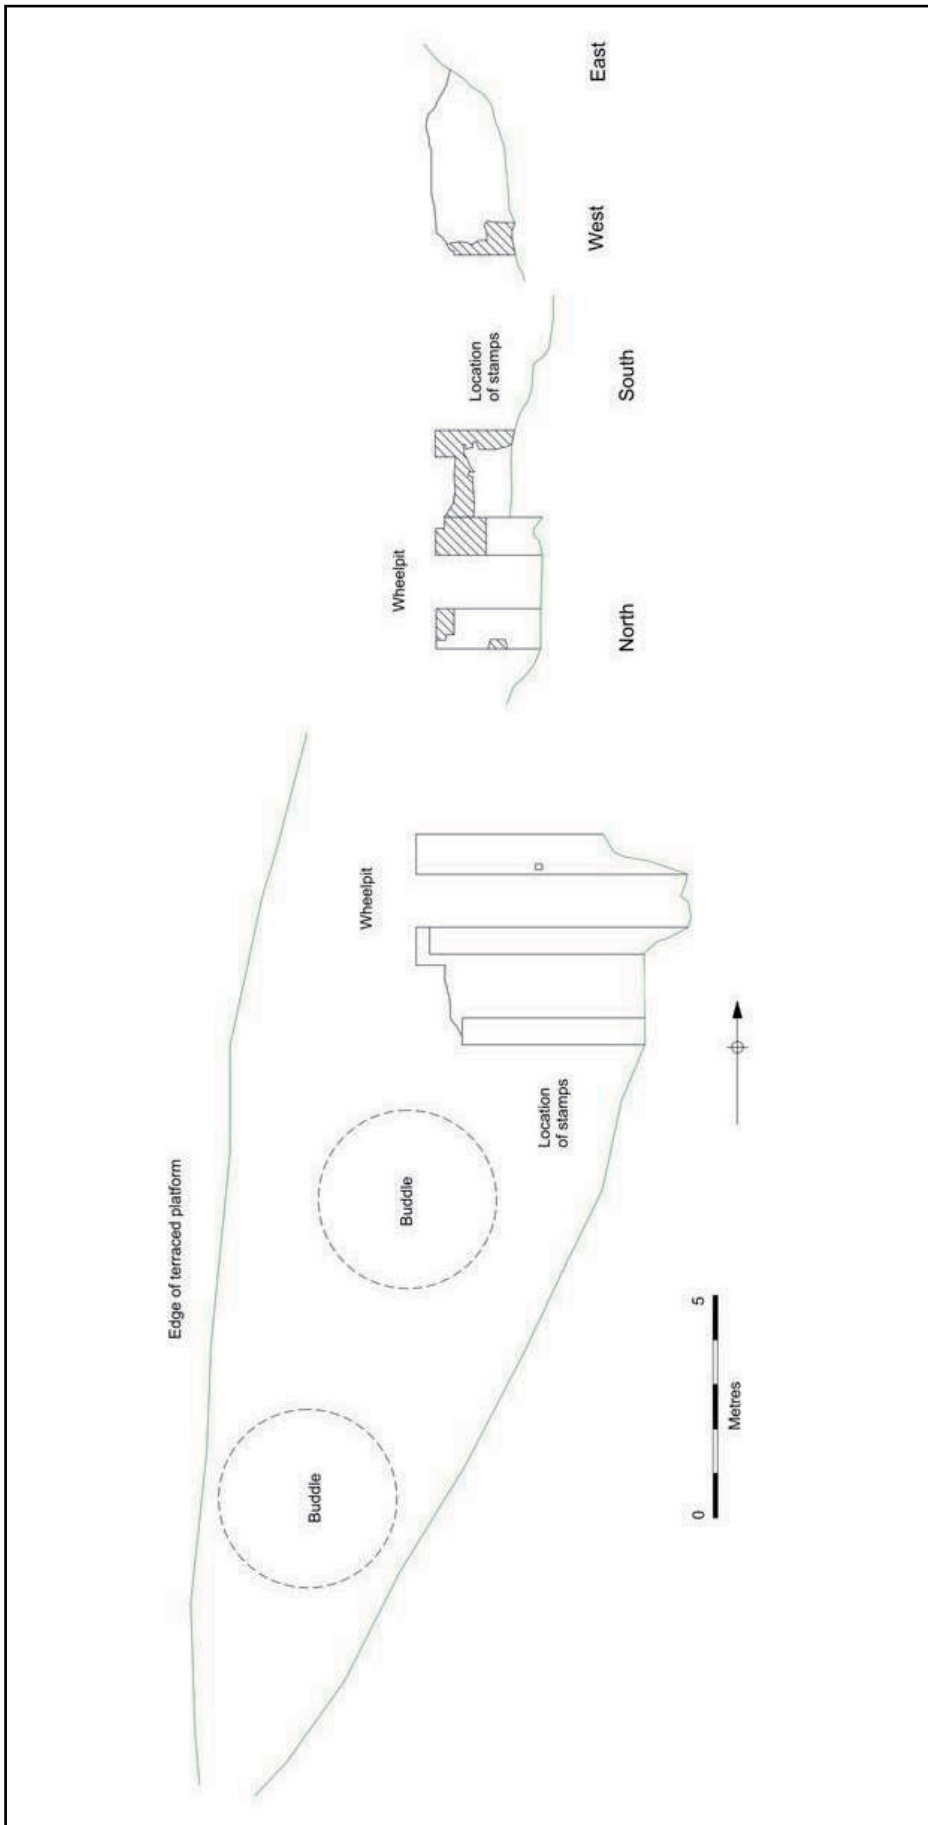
Plan and elevations of the Wheal Coates tributers' stamps, waterwheel pit and dressing floors [190340] / [190341].
